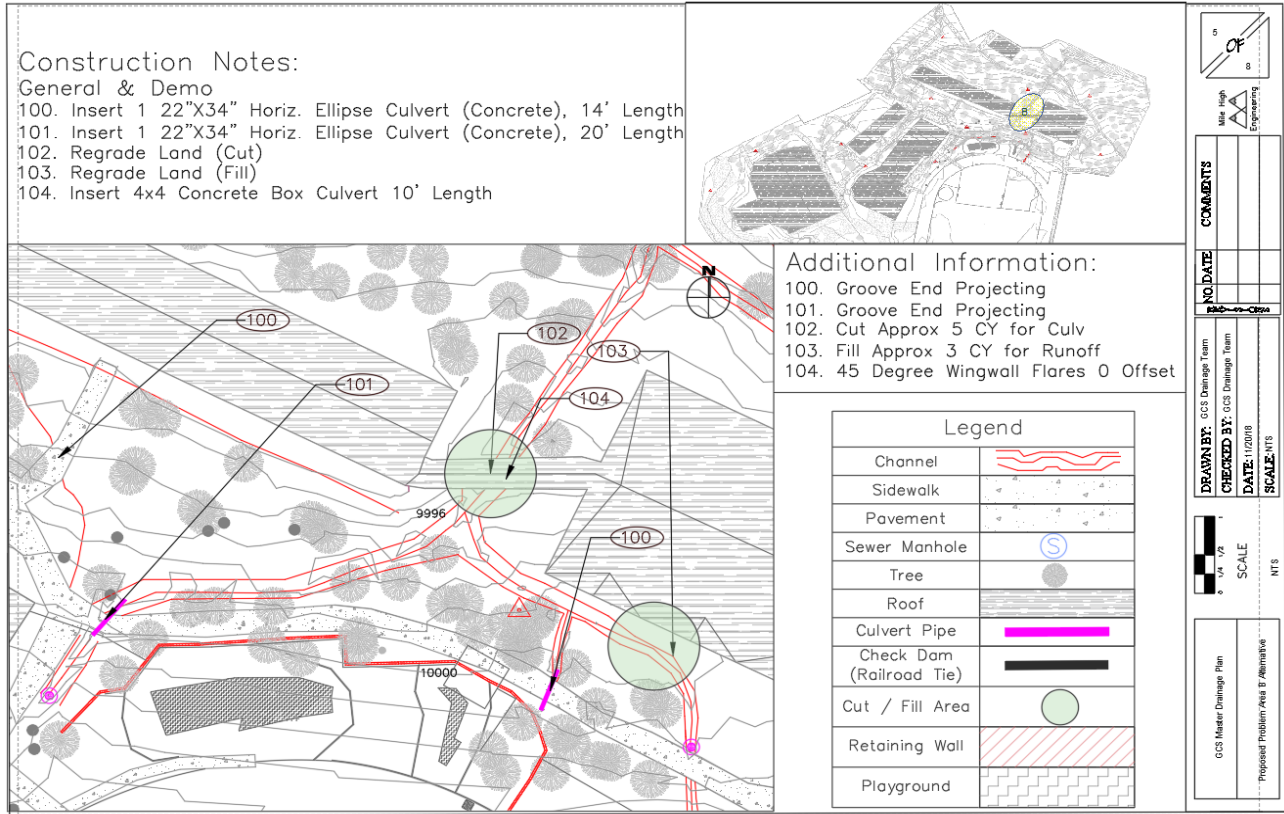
Topographic map of Problem Area B with the proposed alternatives, construction notes, details, and additional information.
